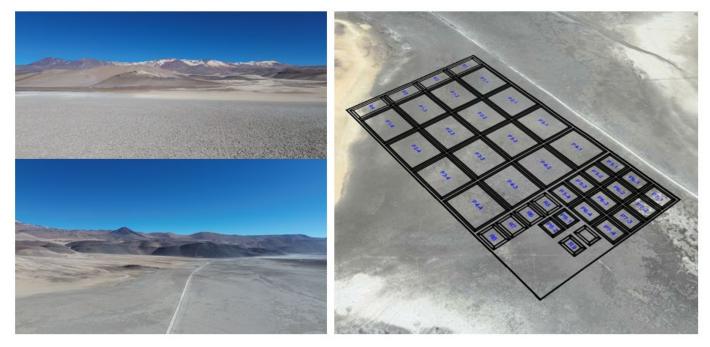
Proposed Pond Location and Layout at Rio Grande Sur
